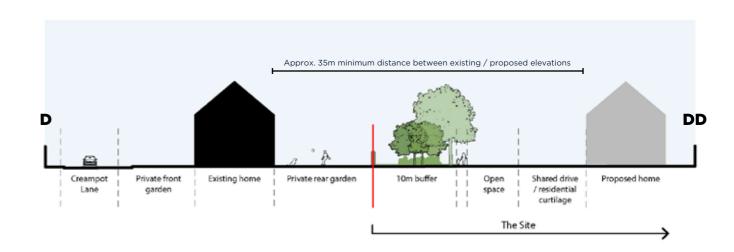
Section D-D showing the 10m planted buffer proposed along the southern boundary of the Site
